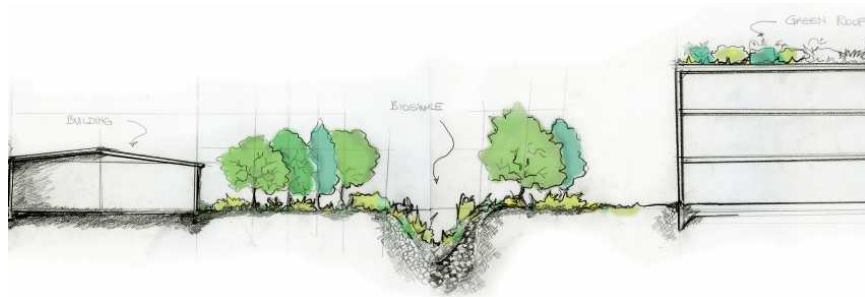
Section of Greenway Encroaching Areas of Infill Development
